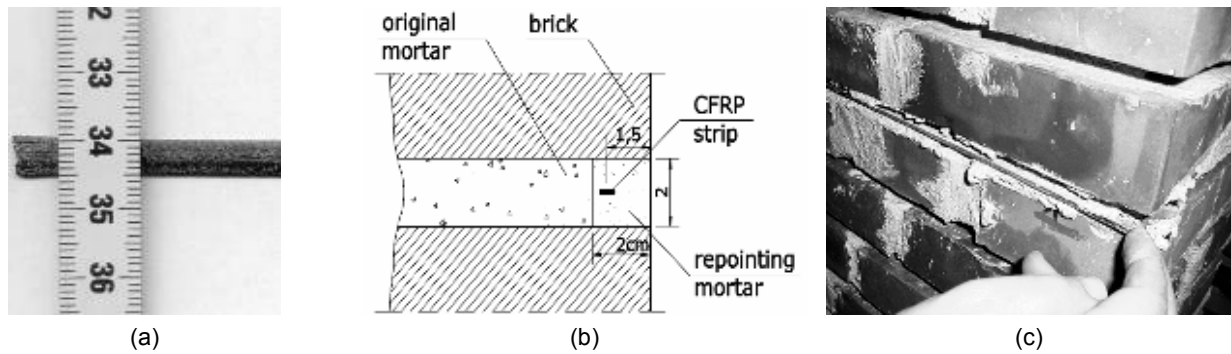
Bed joints reinforcement technique: (a) CFRP thin strip, (b) reinforcement positioning detail, (c) insertion of a CFRP thin strip in a masonry panel, (Saisi et al., 2004) and (Garbin et al., 2009).
